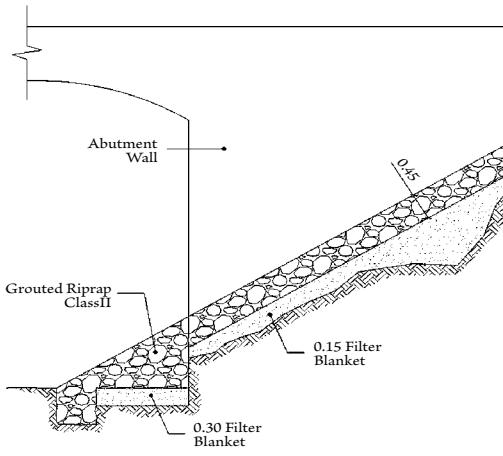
Typical section of grouted riprap over filter blanket for embankment repair.
